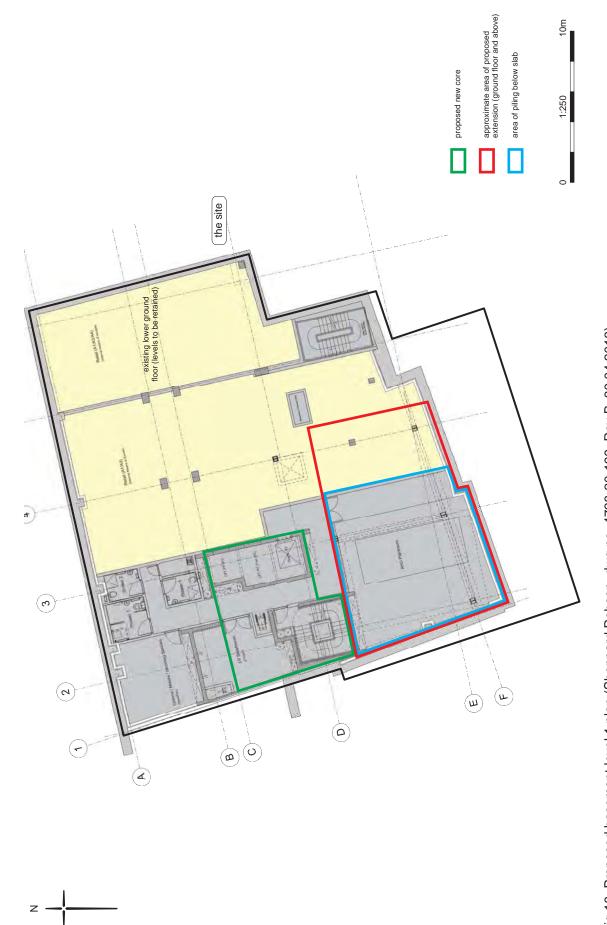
Proposed basement level 1 plan (Sheppard Robson, dwg no. 4728-20-199, Rev B, 30.04.2013)
